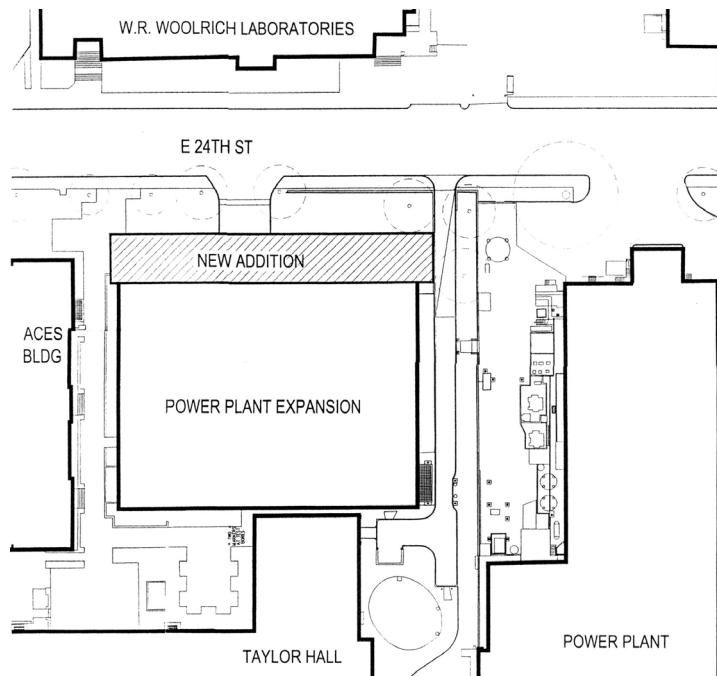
Site Plan: Power Plant and Adjacent Buildings
